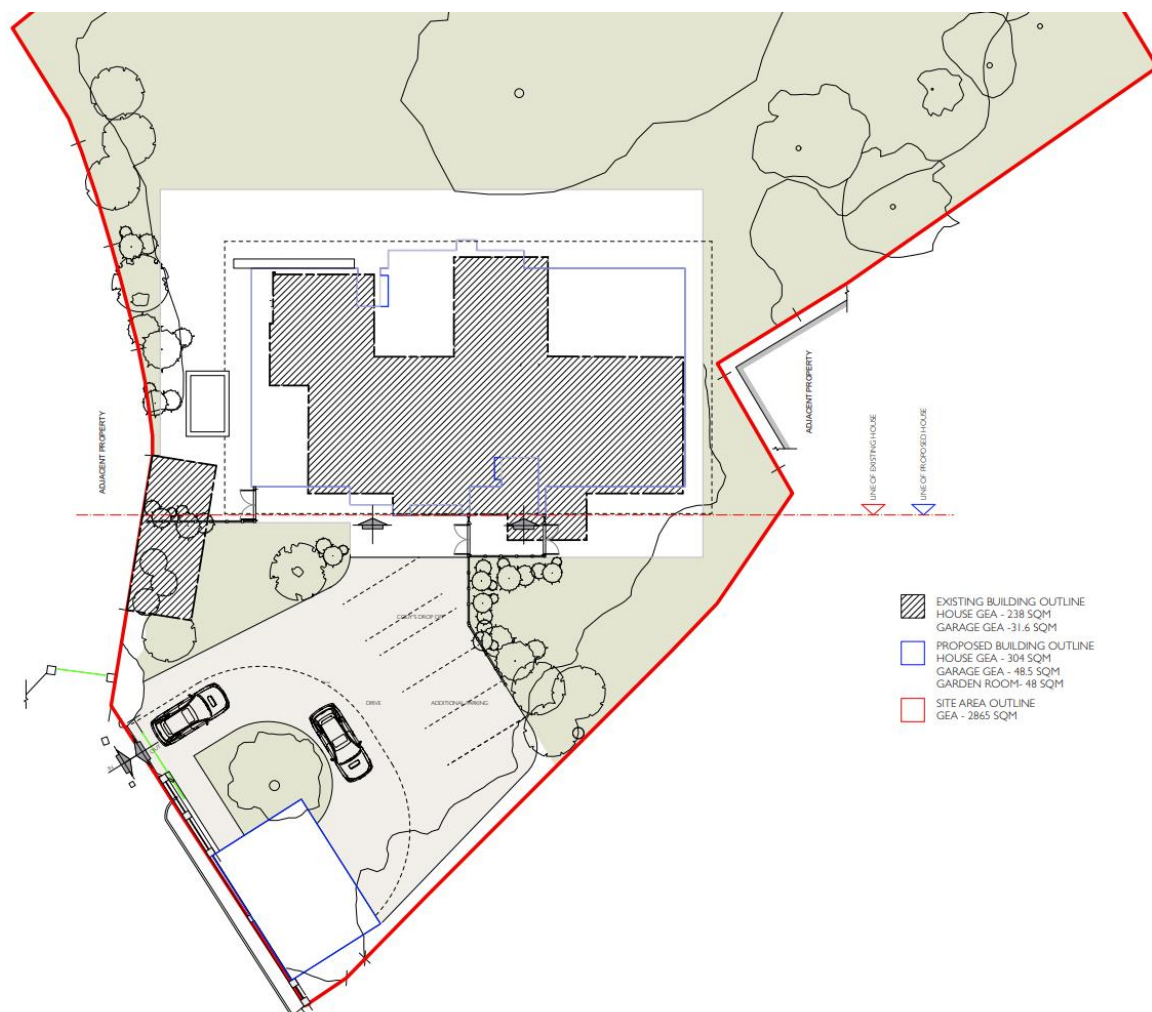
SHOWING THE EXISTING AND PROPOSED PLANS.
